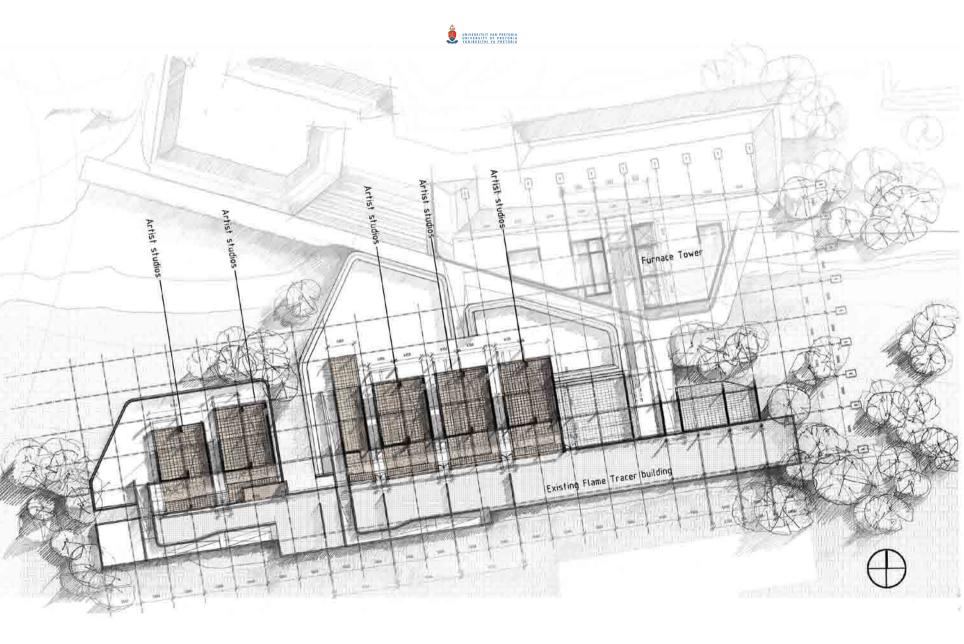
Layout drawing of artist studio (Author, 2011)
